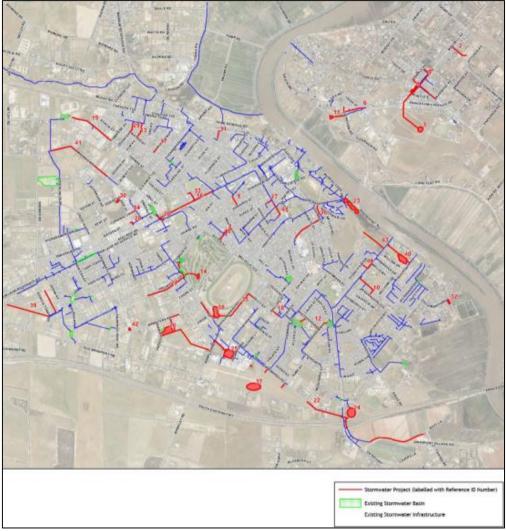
Existing Stormwater Network and Proposed Improvements (from Southfront Drainage Strategy Review)
